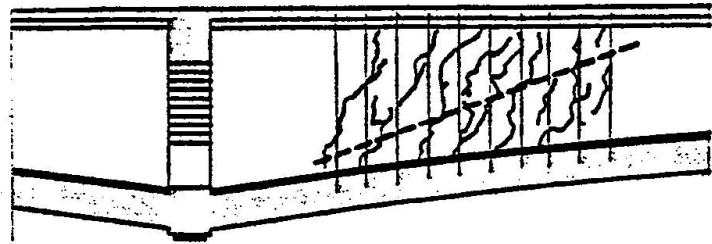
Cracks in prestressed concrete box girder. Theoretical crack is less inclined on the horizontal
